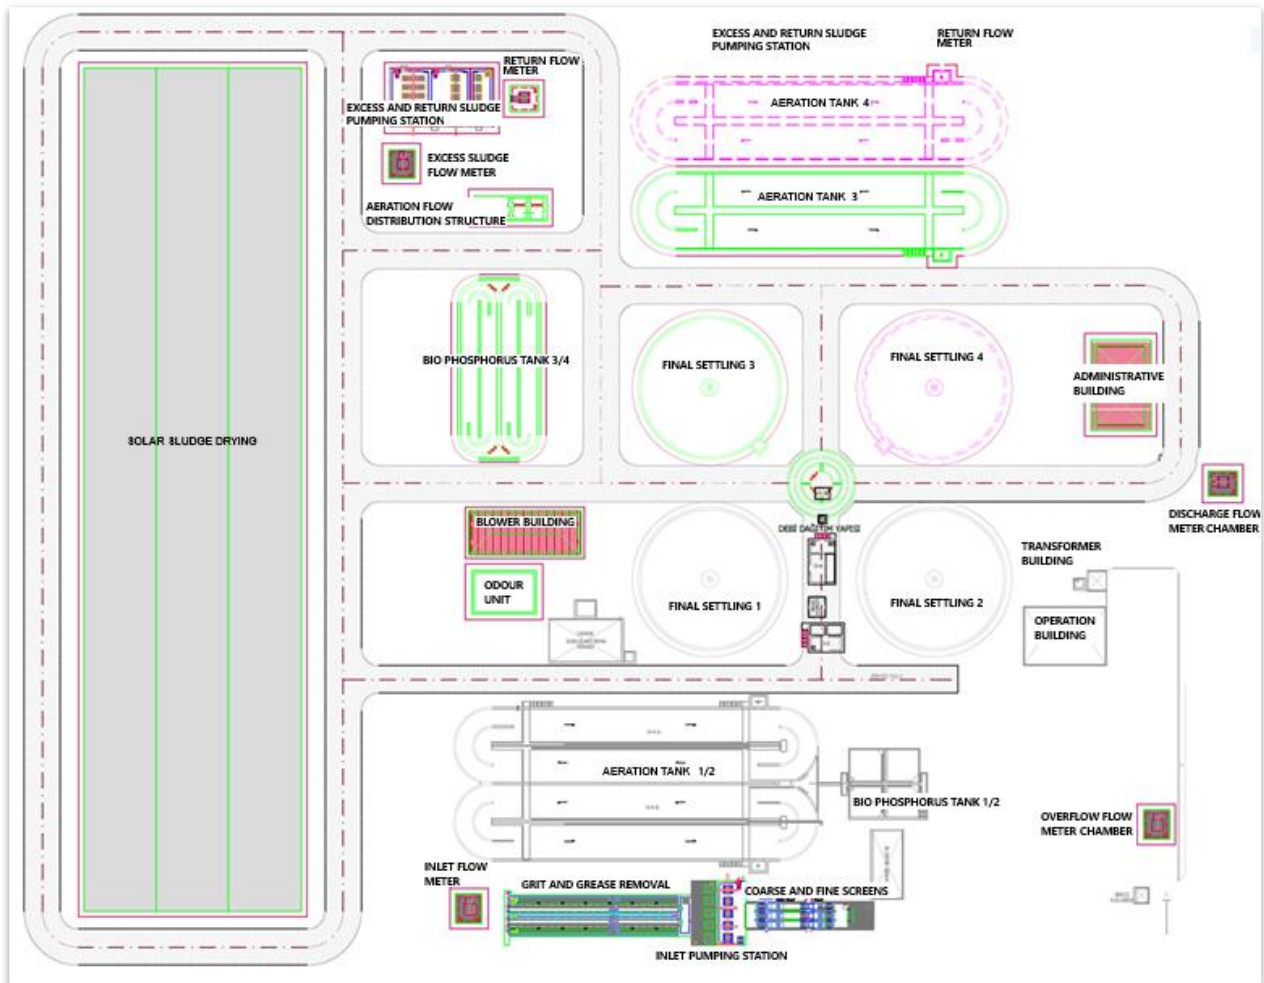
Sub-project's Layout Plan Including Existing Erbaa WWTP Project Components
